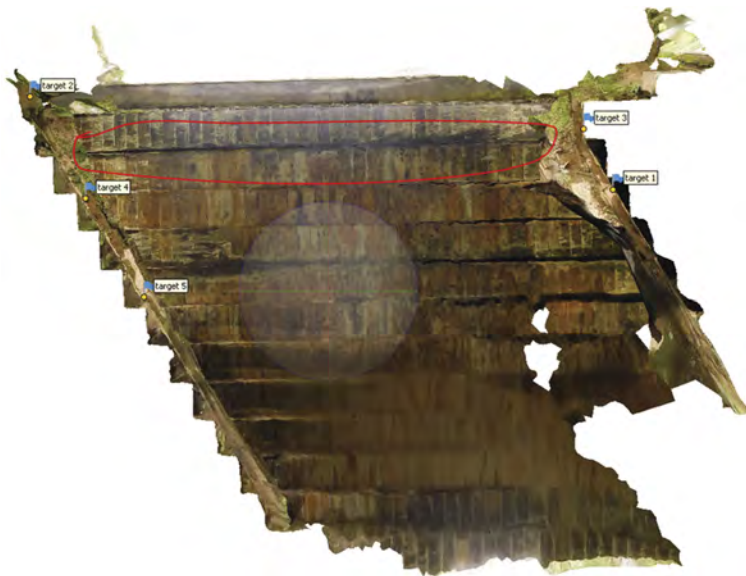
Photogrammetric reconstruction of crack in a ribbed skew railway arch bridge 2022 (viewed from below).
